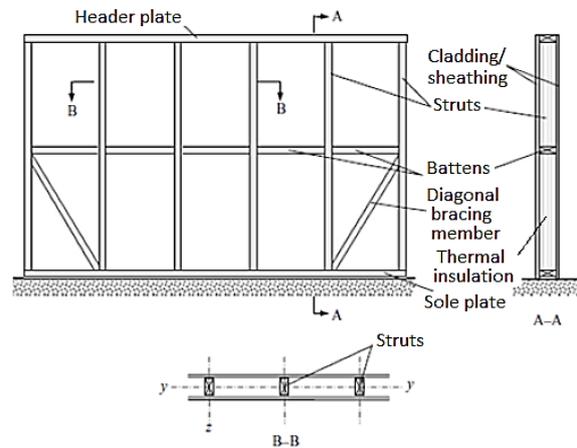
Typical structural solution of load-carrying shear walls for the buildings with the light framework [12].
